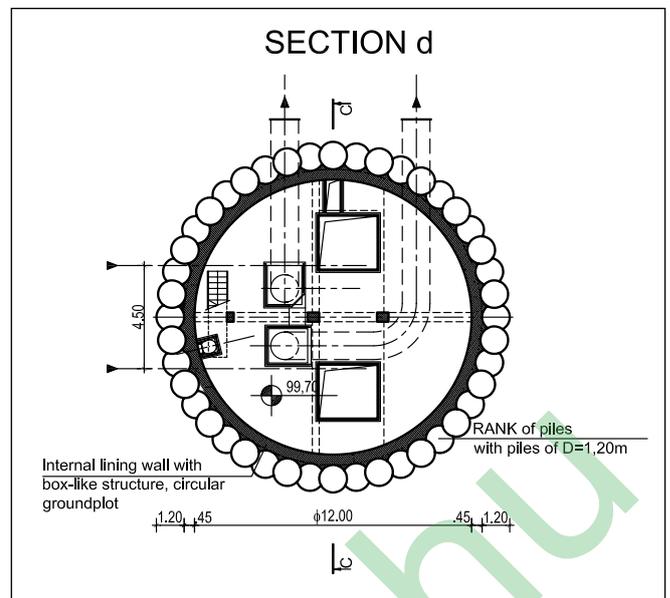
Horizontal section (d) of the structure "B" (final status)
